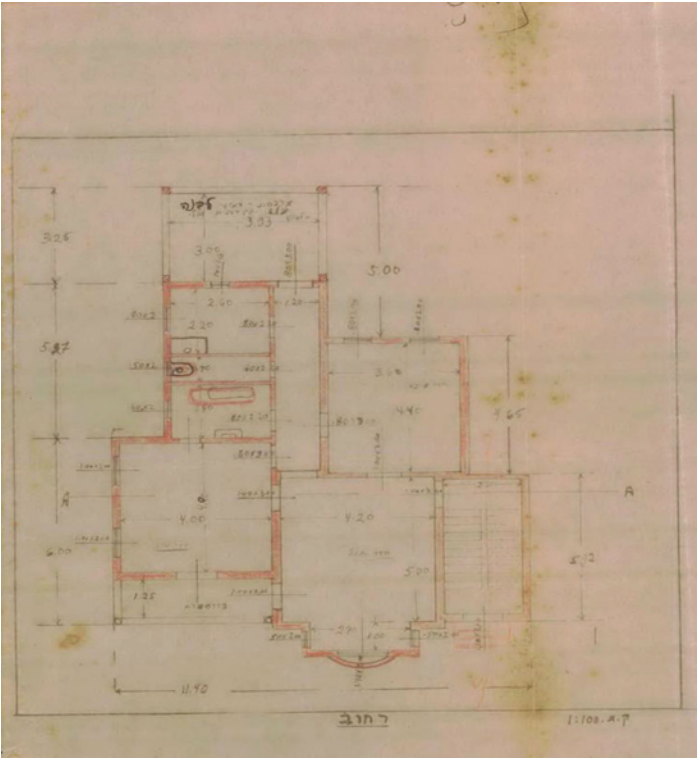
Floor plan of the previous building ("Segal House"), built in 1924
